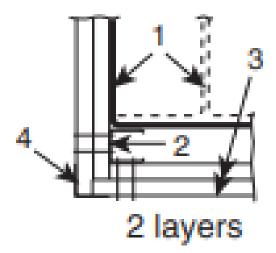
Gypsum Board Protection Installation to HSS Steel Column
